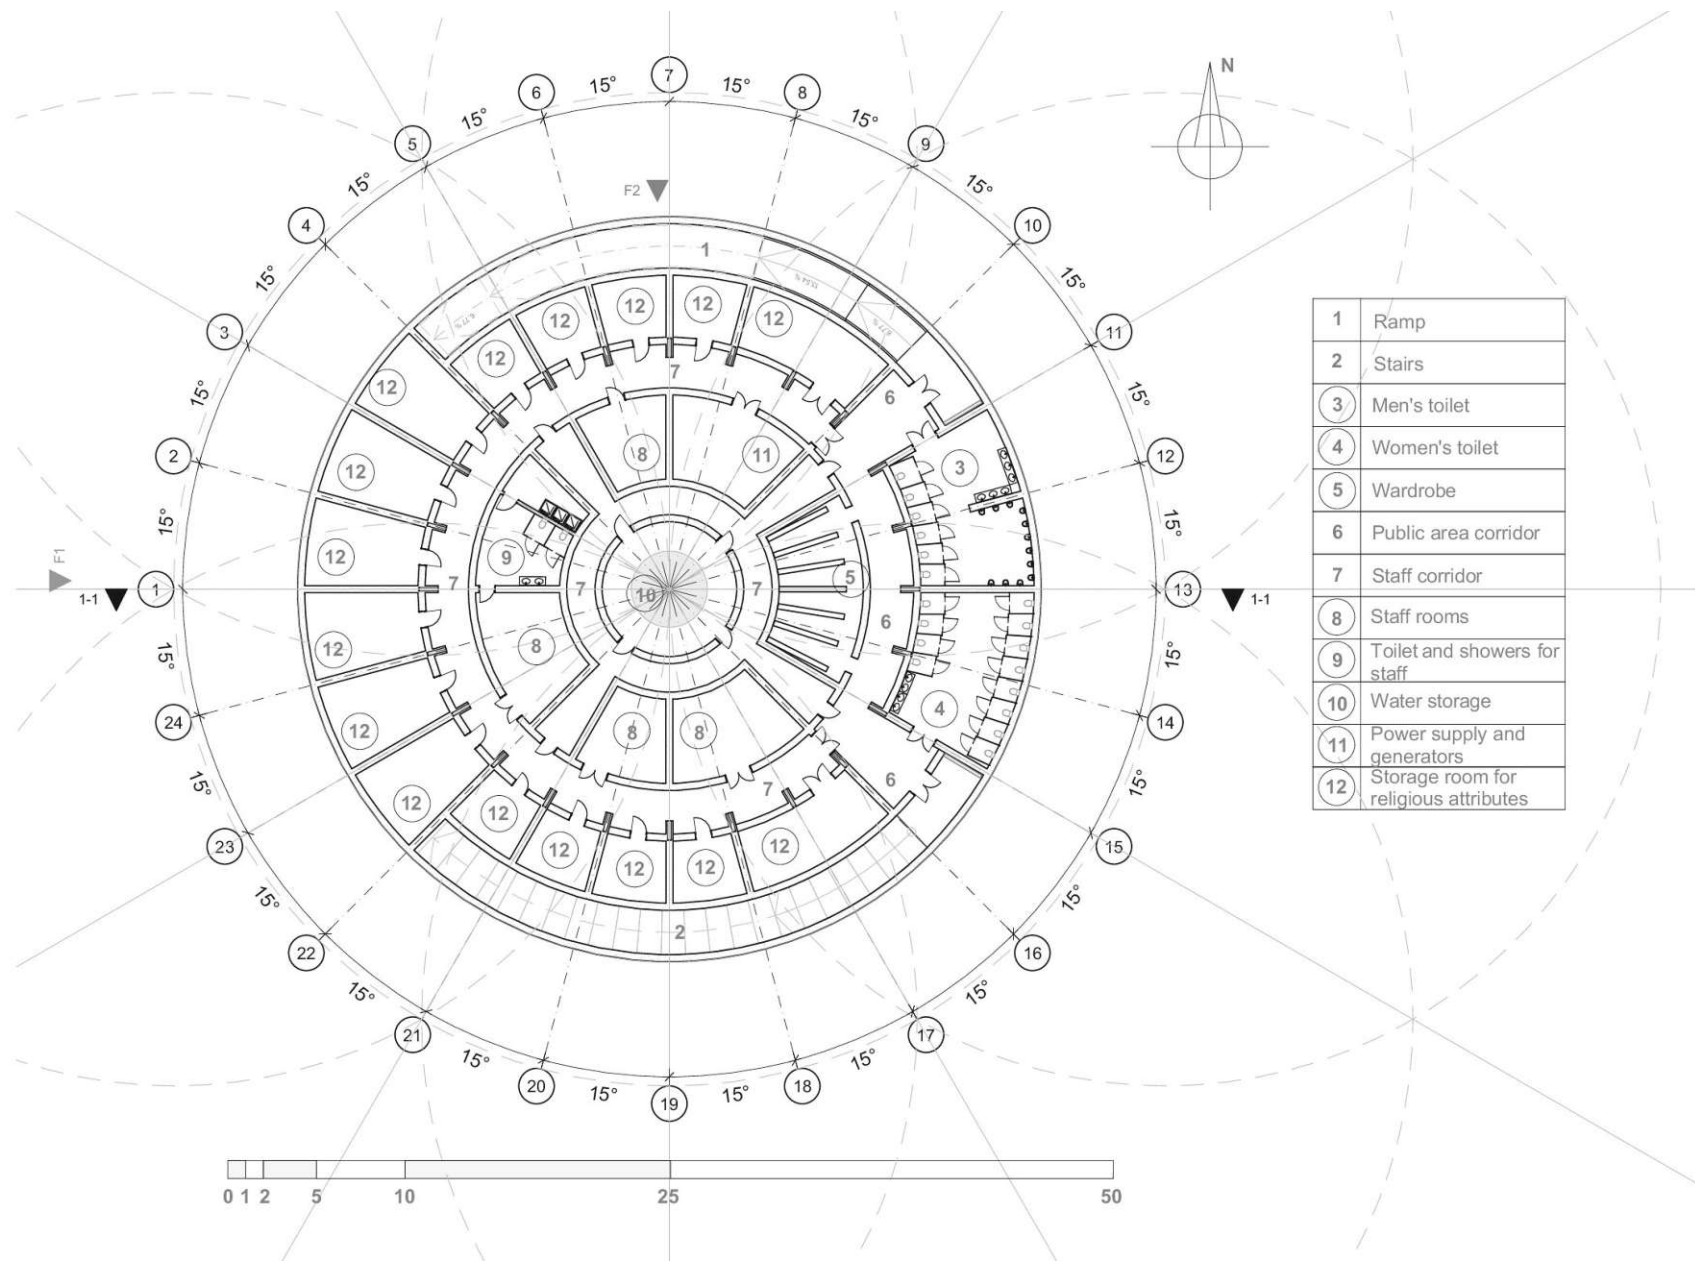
Underground floor of the Church of All Religions (-3.500)
